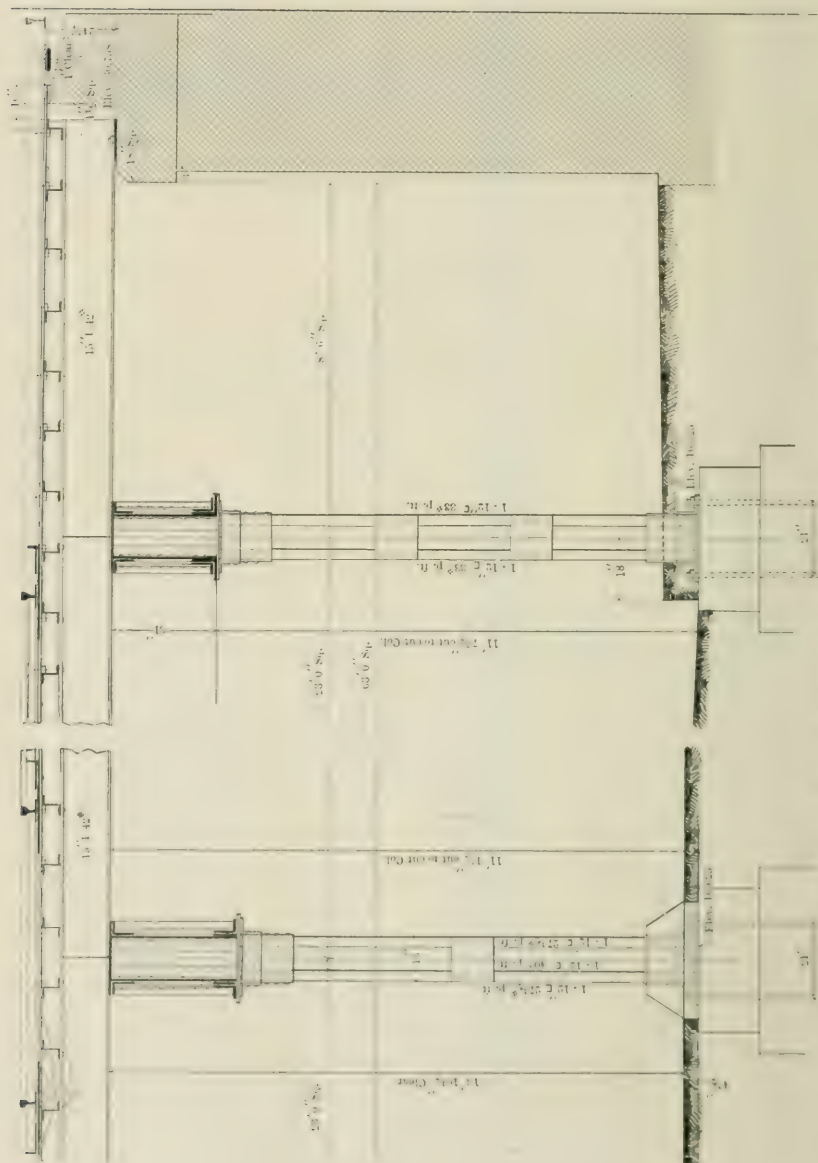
Details of Deck Bridge 61st-63d and State Streets.
